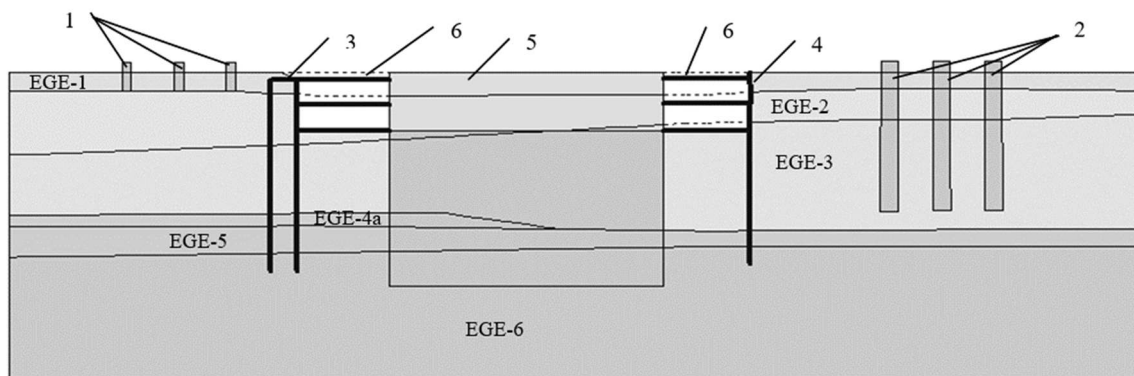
Calculation scheme: 1, 2 – foundations of existing buildings;
